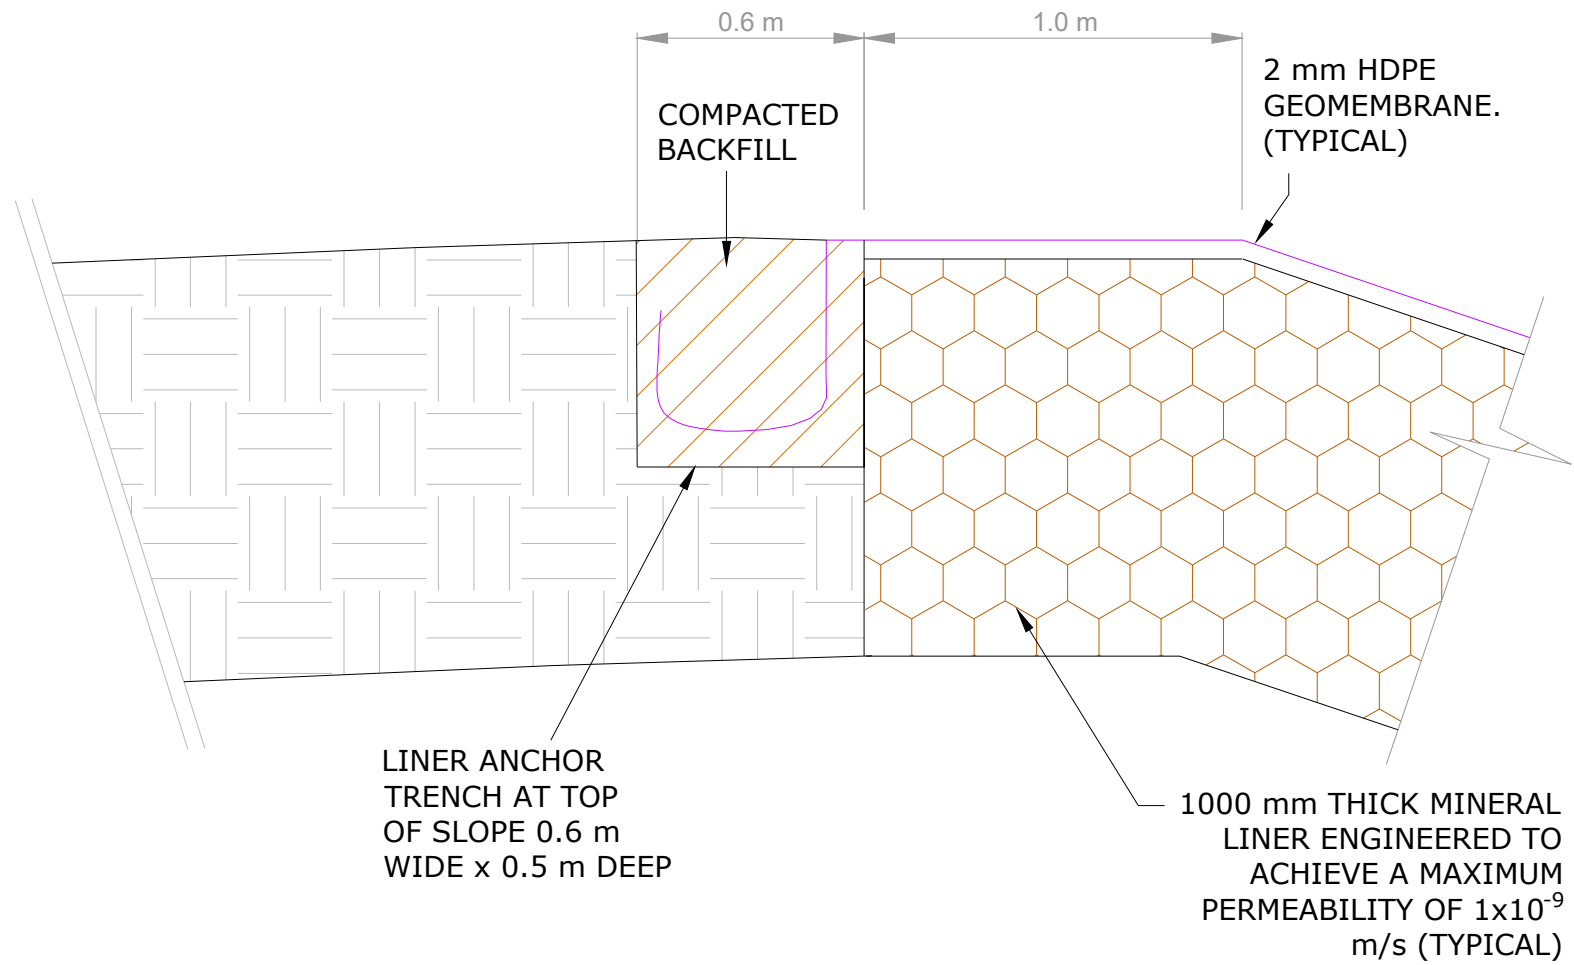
; TYPICAL SOUTH ATTENUATION POND EXTENSION TIE IN. (Scale: 1/50 A1)
